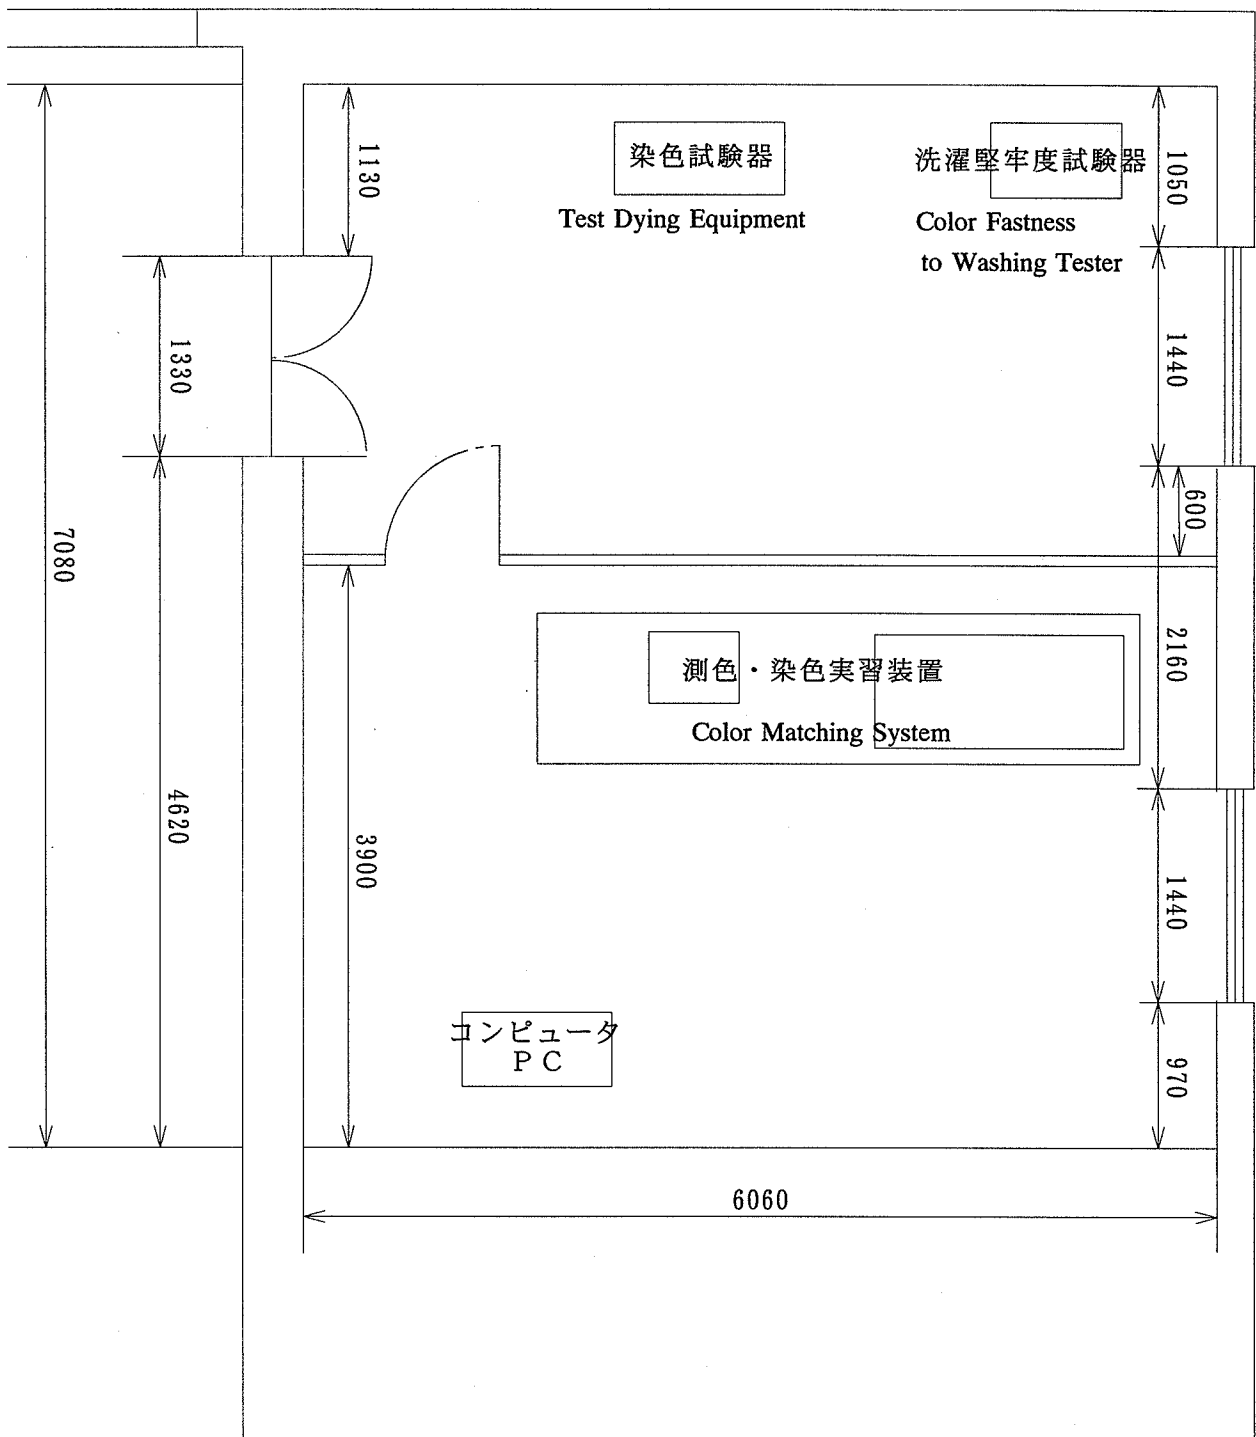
Layout plan (5) Color Matching System Lab.
